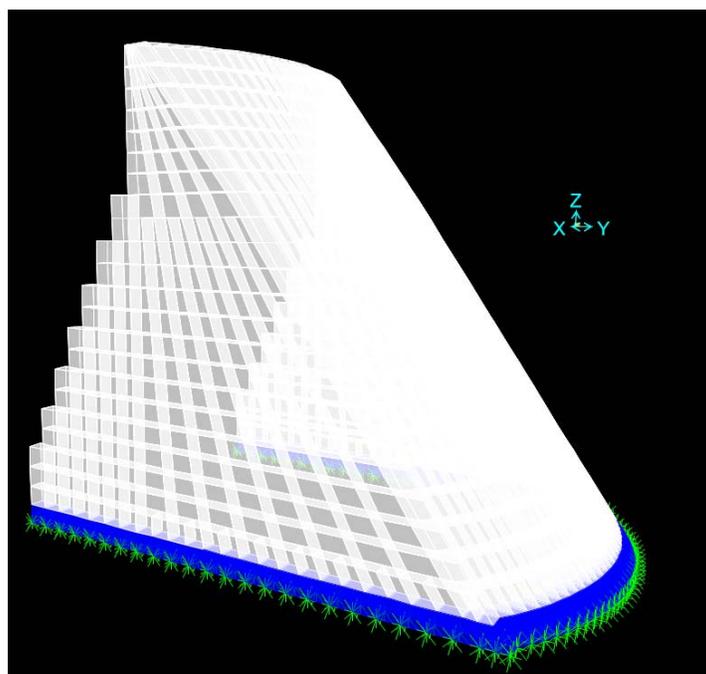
Assumed Shear Plane Failure Location Shown in Blue
